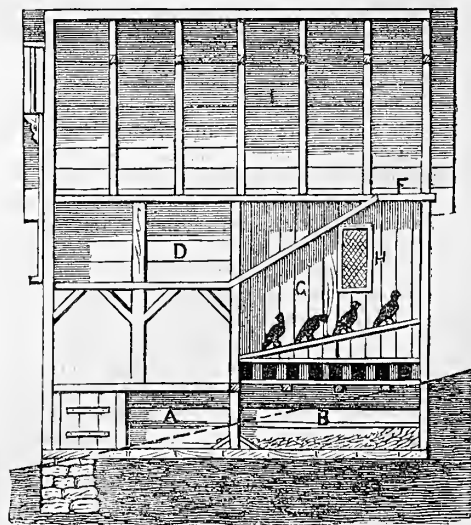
SECTIONAL VIEW OF BUILDING.
